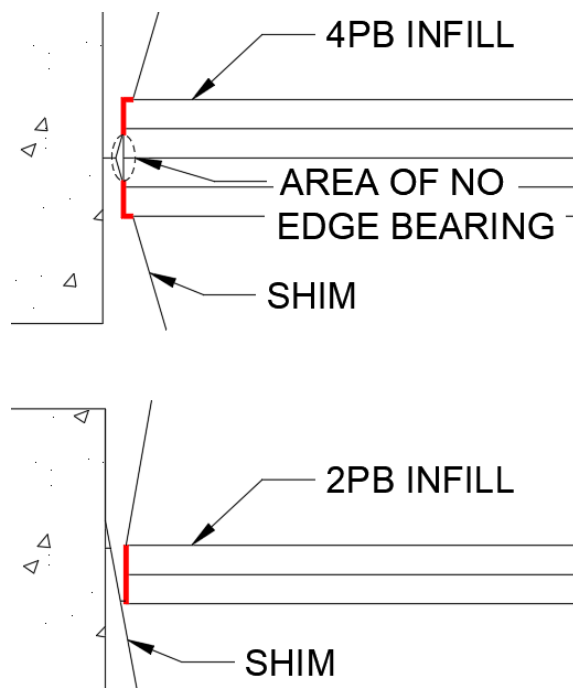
Idealized Shim Bearing Edge-Joint Contact Areas
